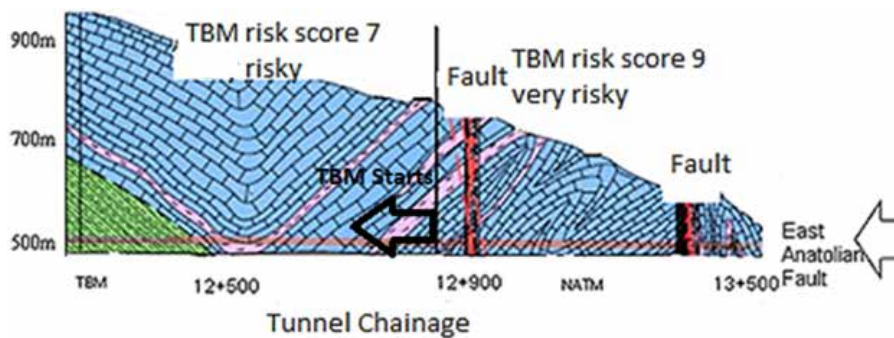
Cross section of the Nurdagi tunnel planned to be excavated by NATM.
